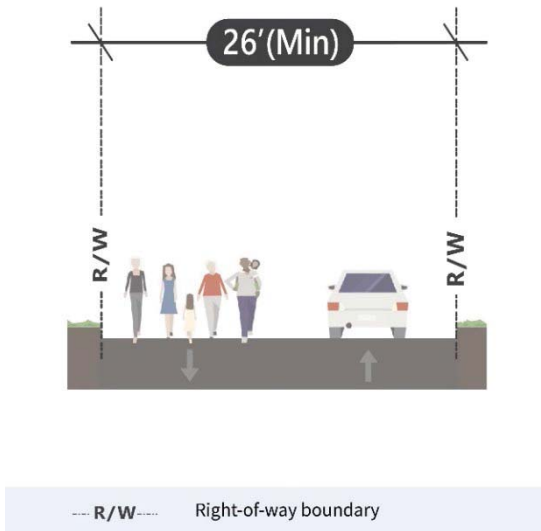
Proposed Cross Section – Shared Alley/Laneway
